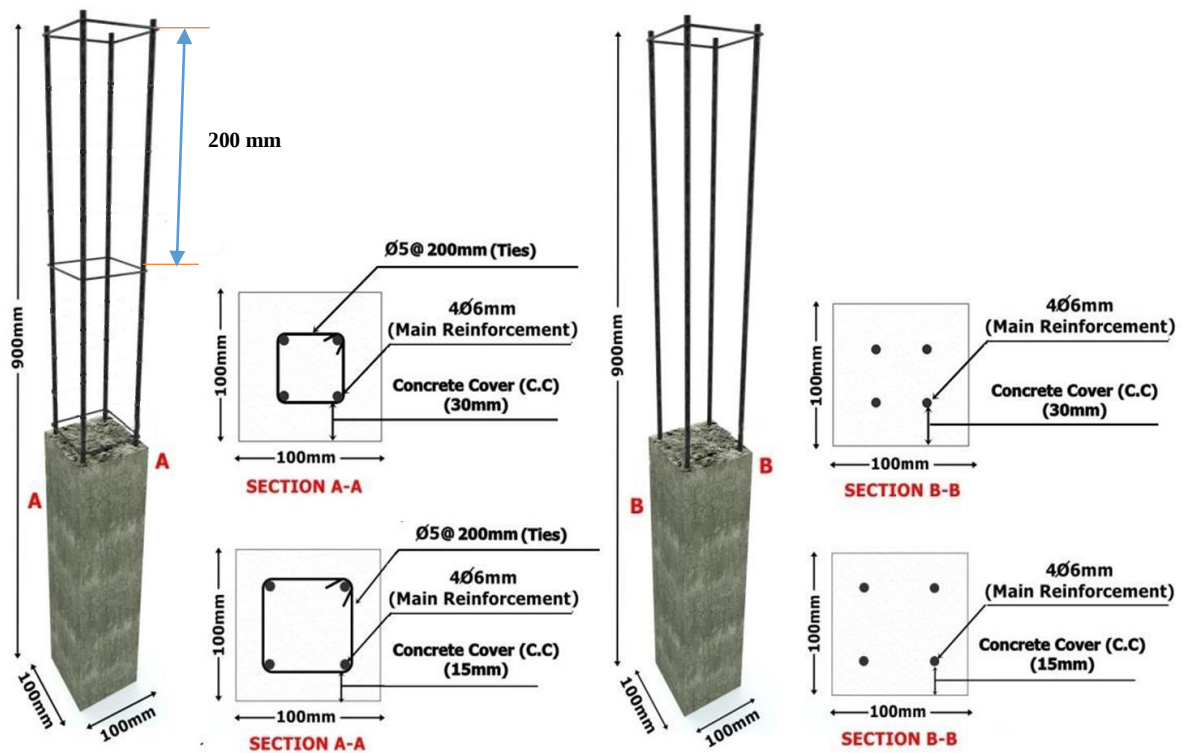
Column Samples Reinforcing Details with Column Dimensions.
